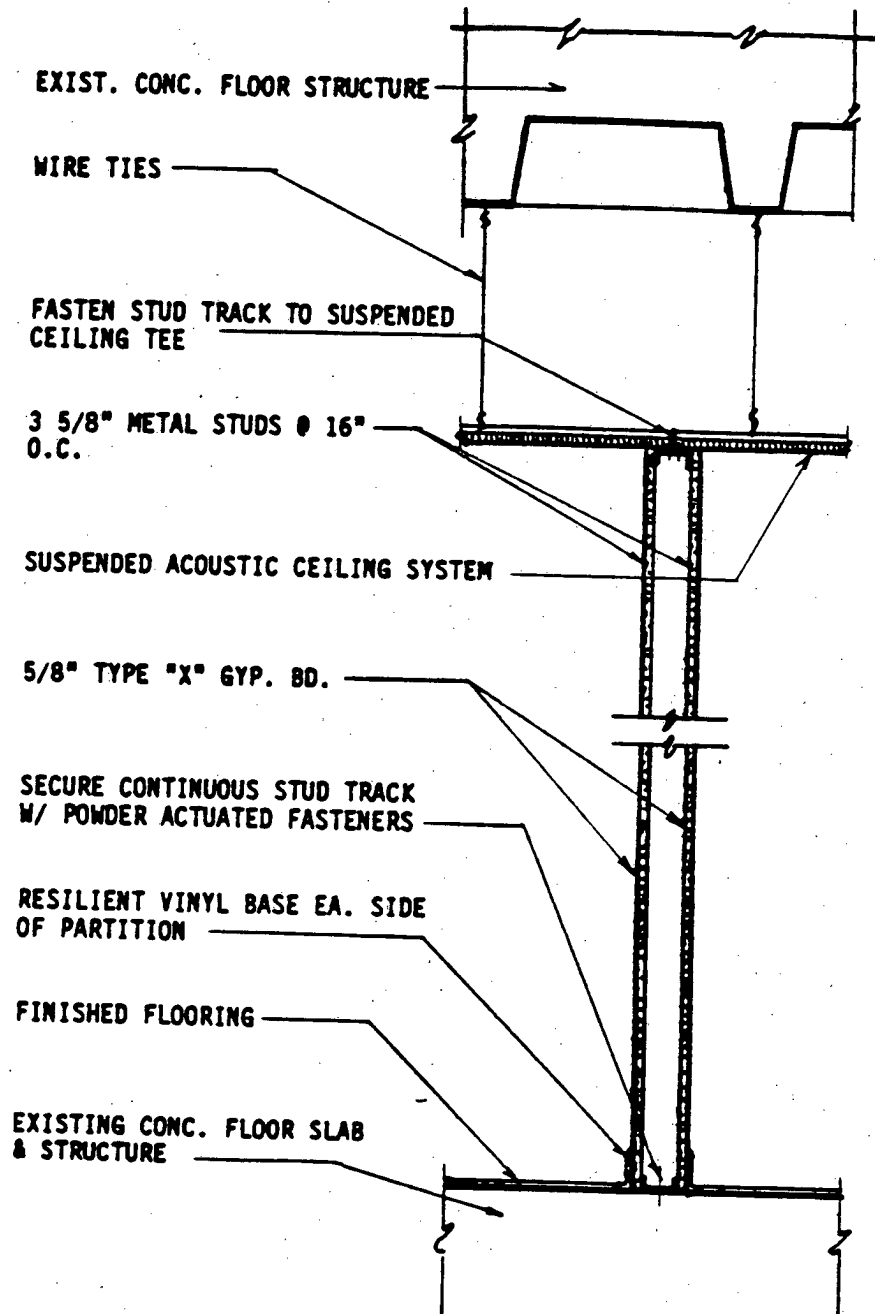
STANDARD INTERIOR WALL CROSECTION
